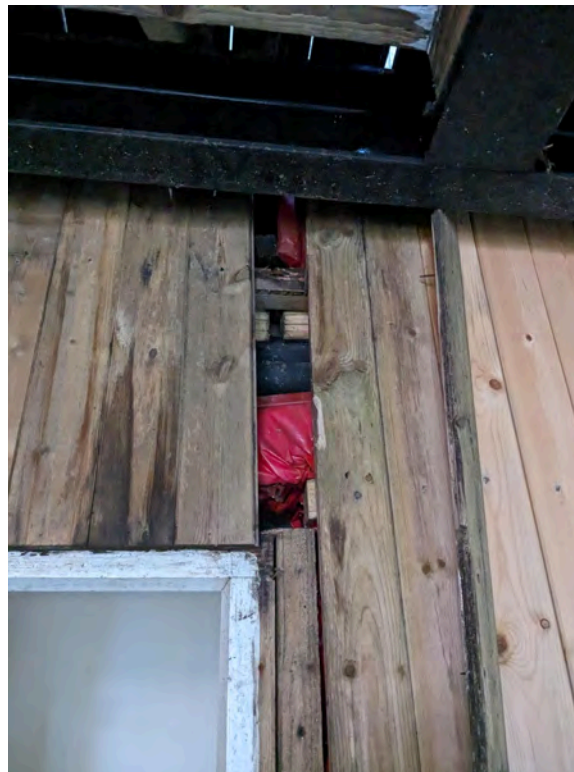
Location 21 - Cavity with cavity barriers, timber studs and thermoplastic insulation.
